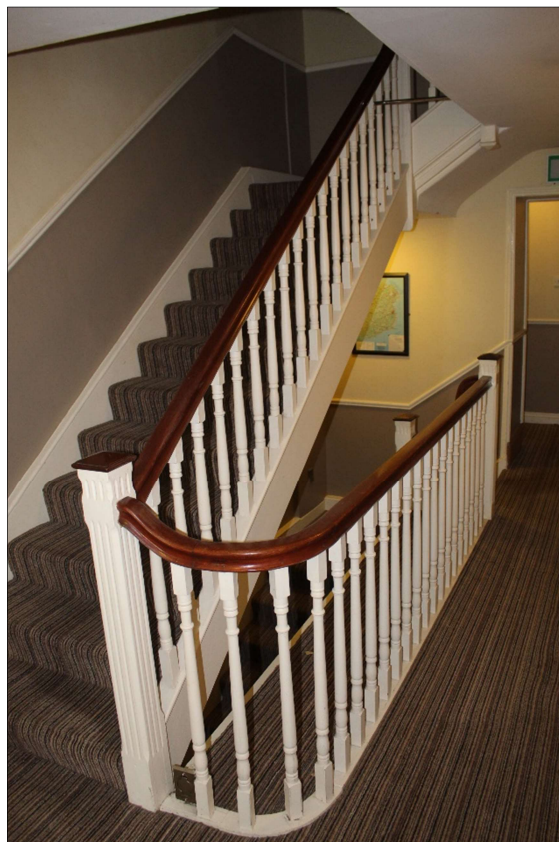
First floor landing of timber staircase within historic street-fronting block. Staircase may contain historic elements and later alterations.
